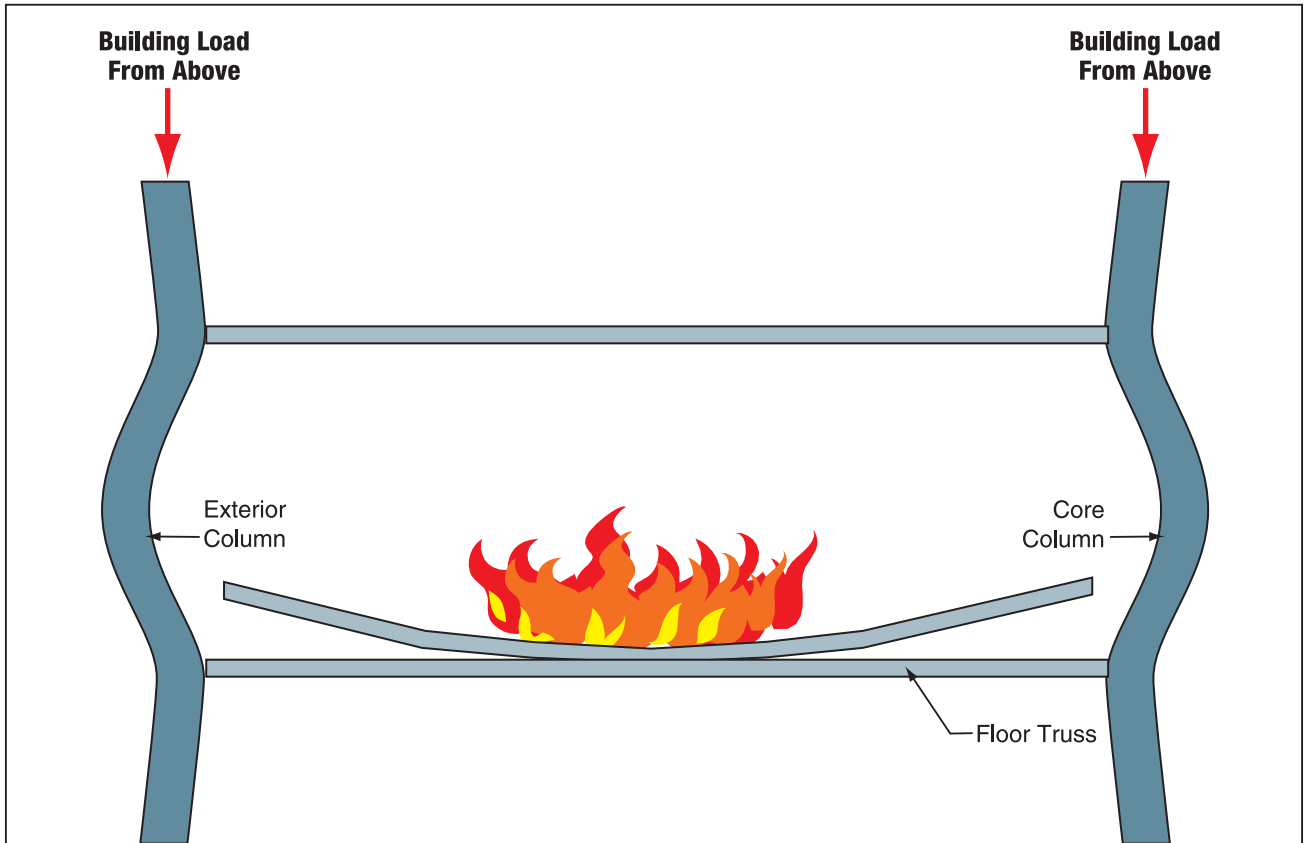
Buckling of columns initiated by failure of floor framing and connections.
